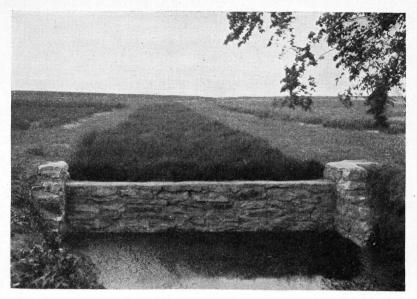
A masonry structure has been used at the lower end of the channel to carry the run-off over a critical overfall to a stabilized drainageway.
